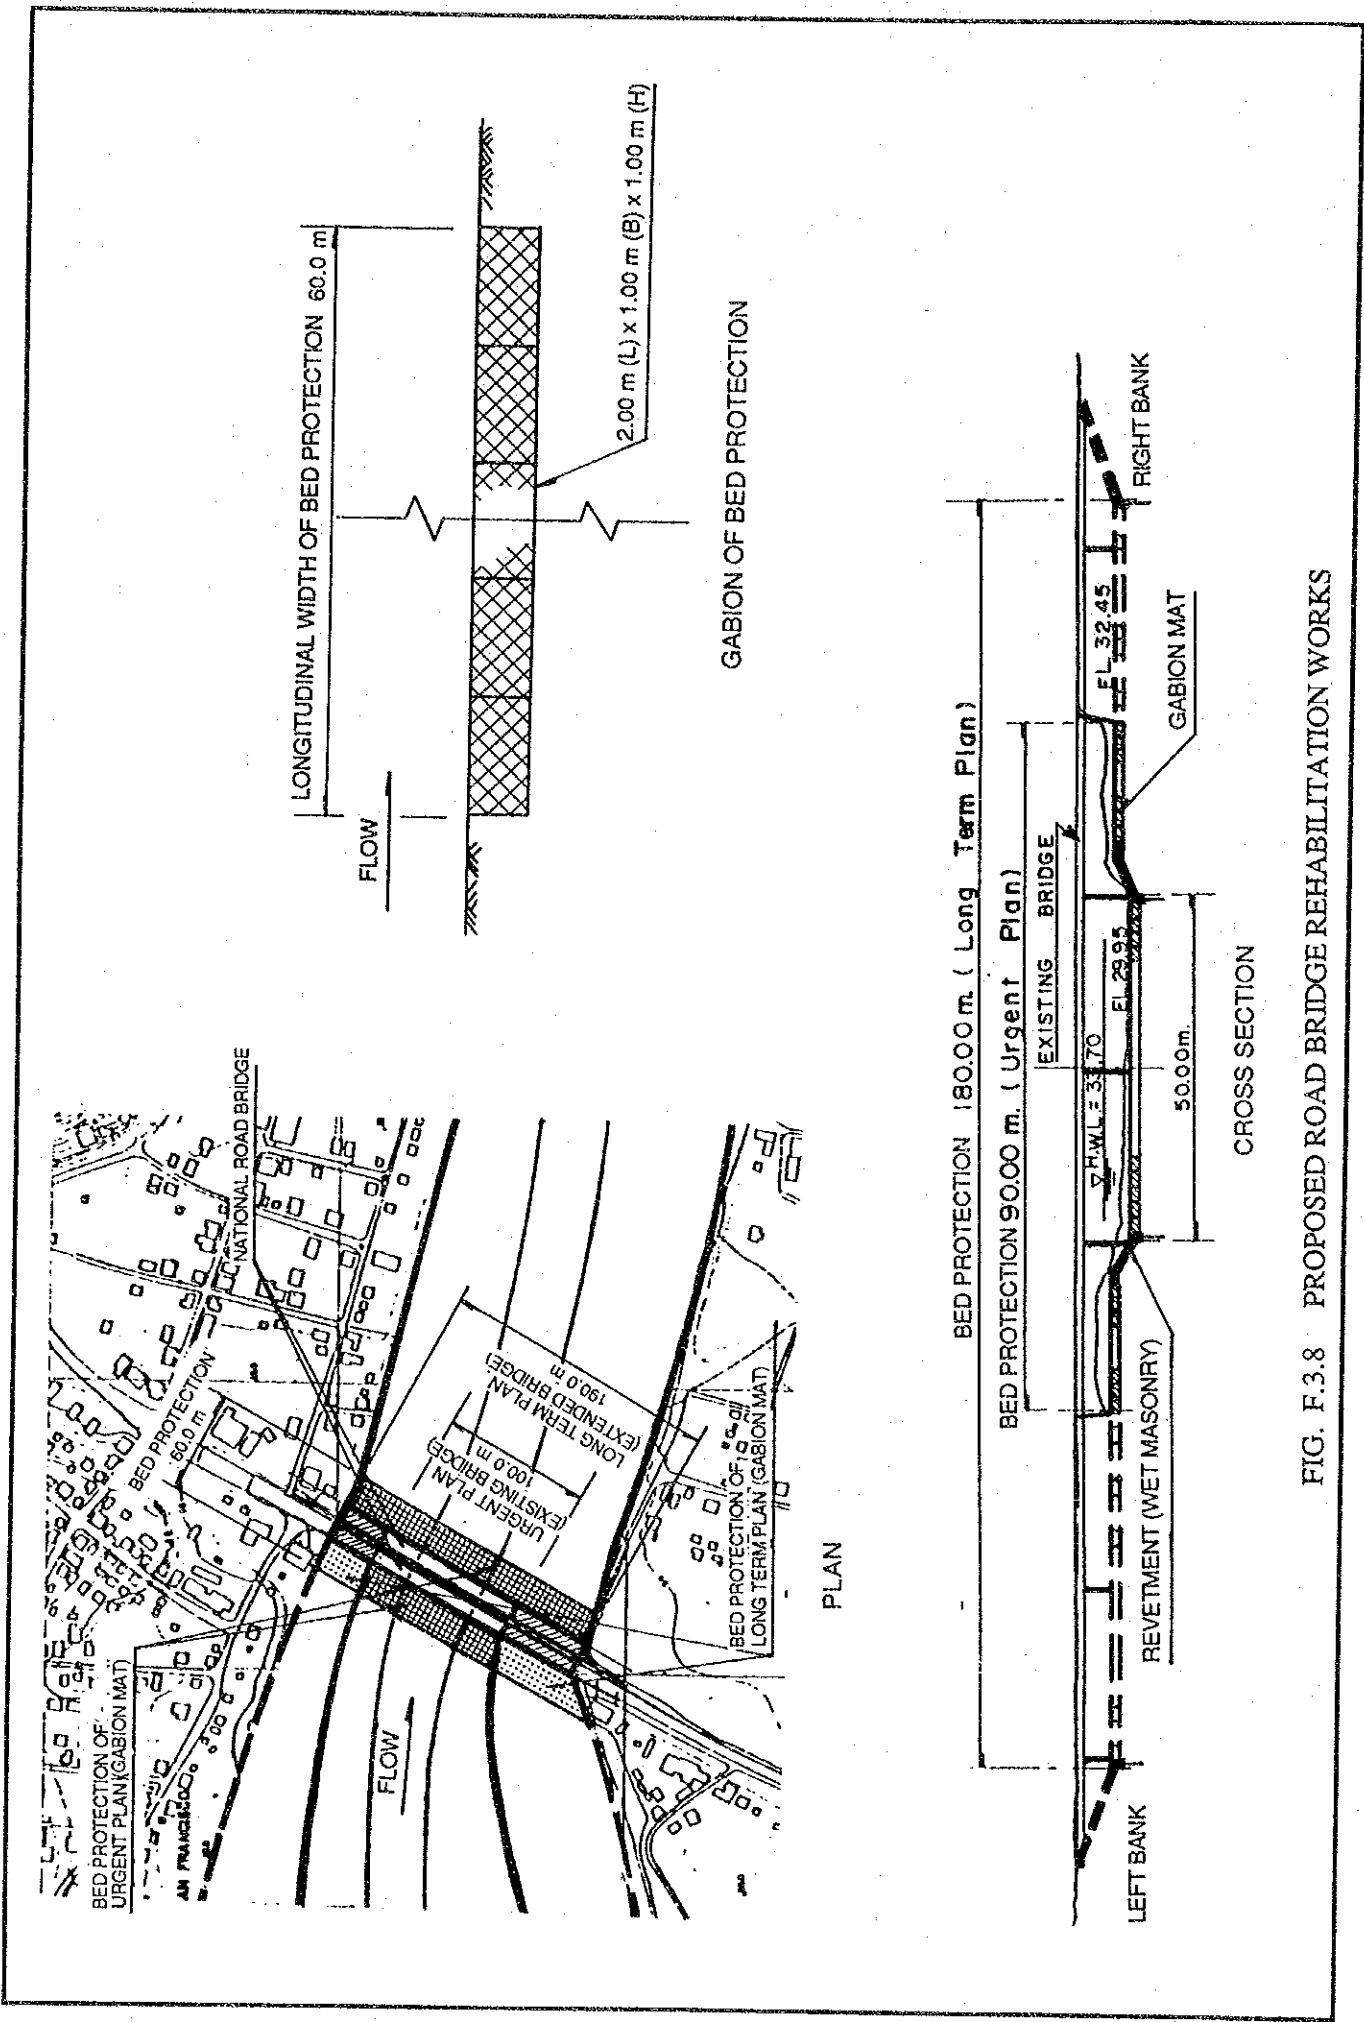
PROPOSED ROAD BRIDGE REHABILITATION WORKS
